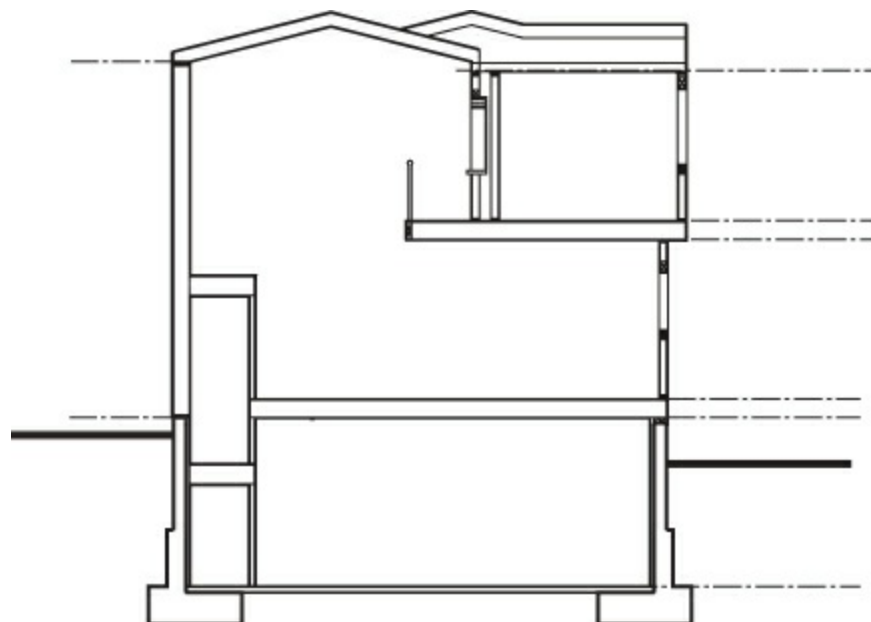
Stage II: Outlining of foundation, walls, and roof.
